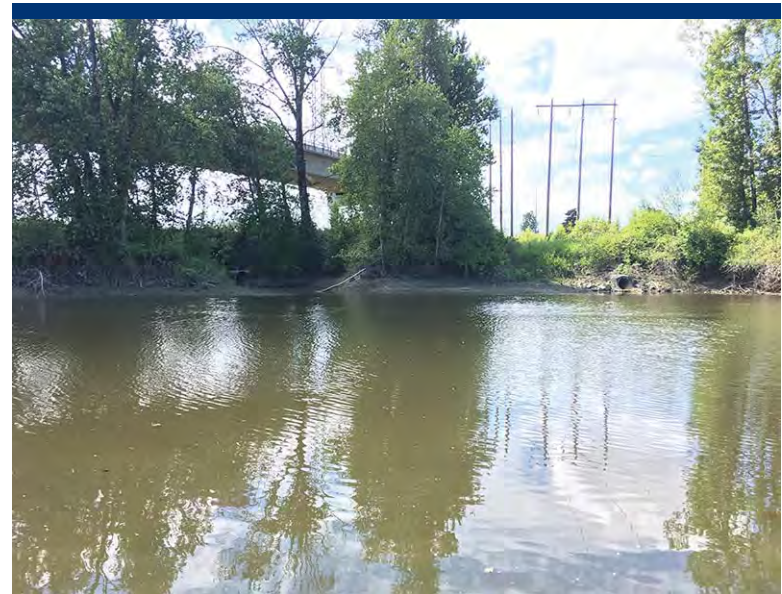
Culvert outfalls to Columbia River Slough. Left culvert drains pond, right culvert drains area north of pond.
